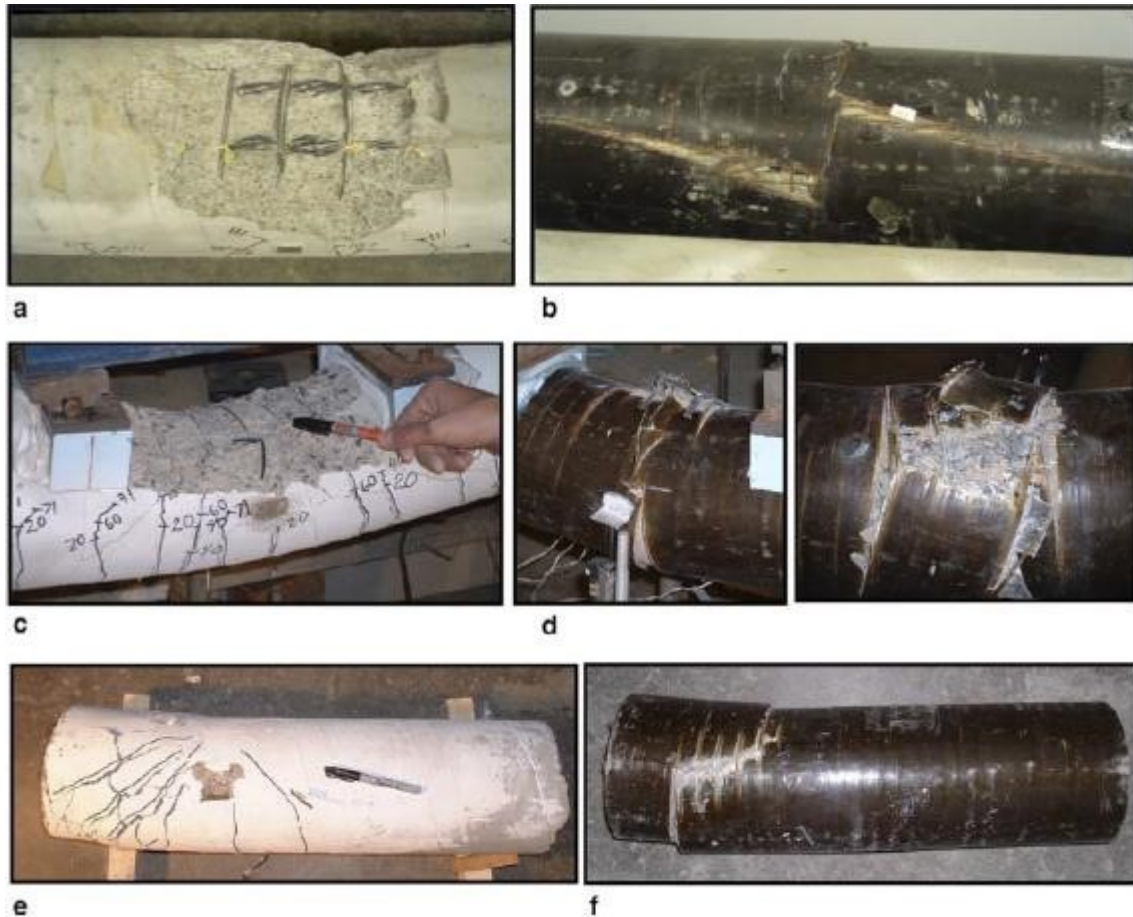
Different failure modes: (a) Beam B1, crushing and spalling of concrete cover; (b) Beam B2, failure of GFRP tubes under bi-axial stresses on compression side; (c) Beam B3, crushing and spalling of concrete cover; (d) Beam B4, GFRP tube failed in longitudinal tension, then in longitudinal compression, followed by hoop tension; (e) Beam B5, shear-bond failure; (f) Beam B6, shear-bond failure (Fam et al. 2007)
